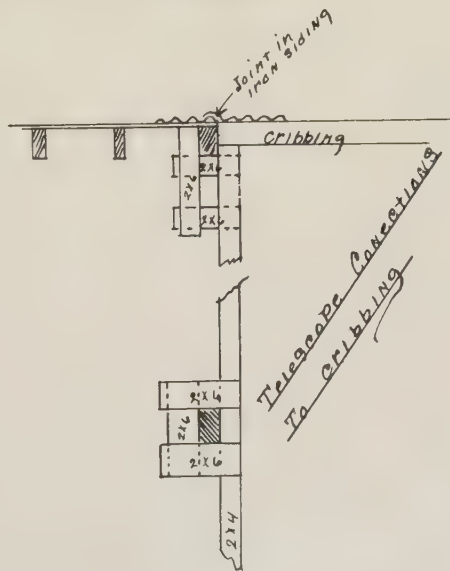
DETAIL OF TELESCOPE FRAME AGAINST CRIBBING
